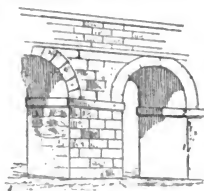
Roman system of arches and vaulting resting on pilasters. (Martha.)
